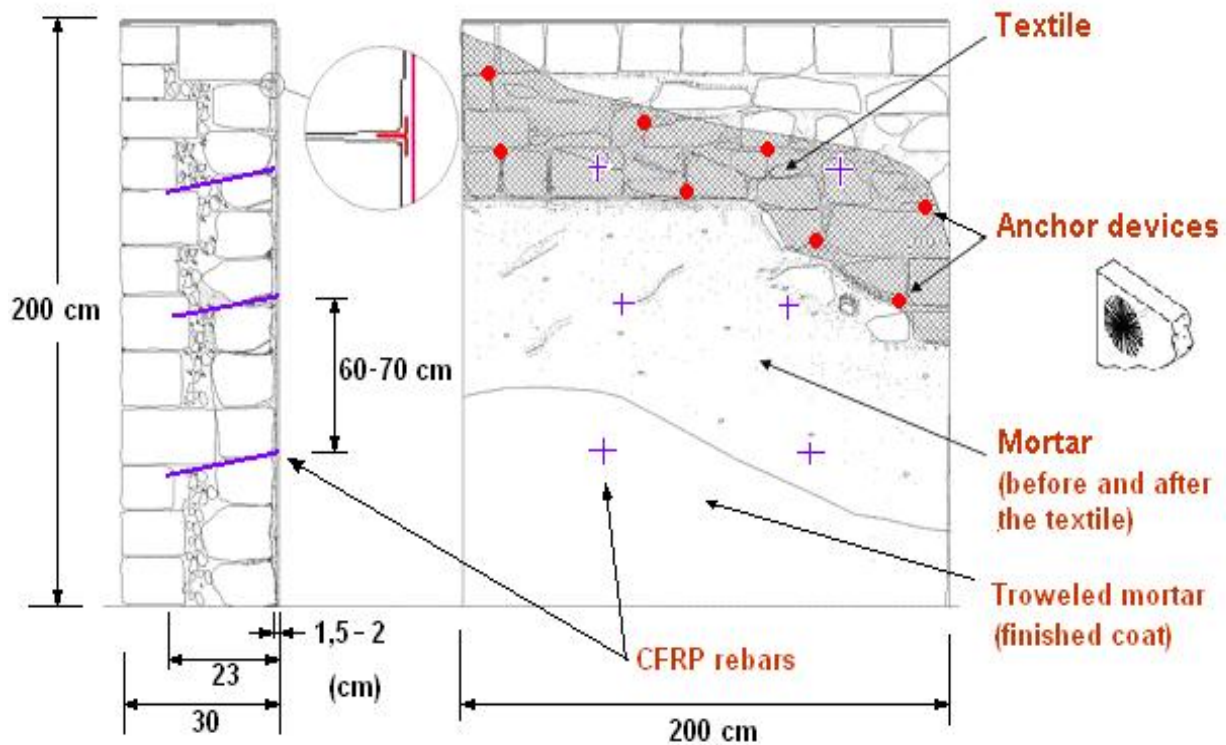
Masonry stone wall strengthened with FRP grid plus mortar
